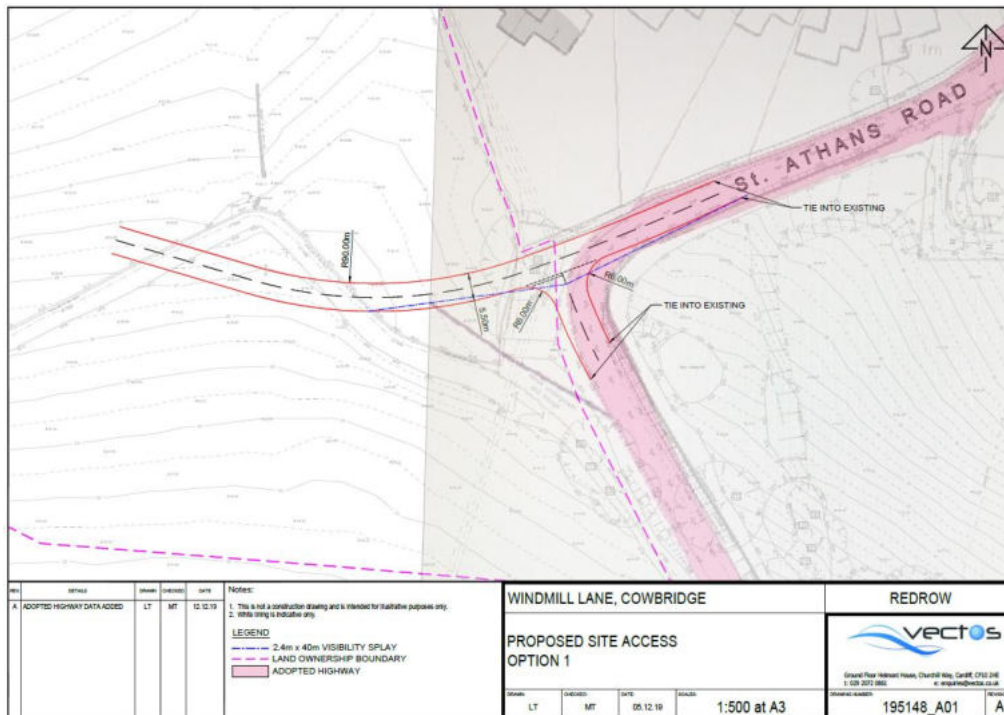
Site location (MG2 (19), St Athan Road, Cowbridge.
